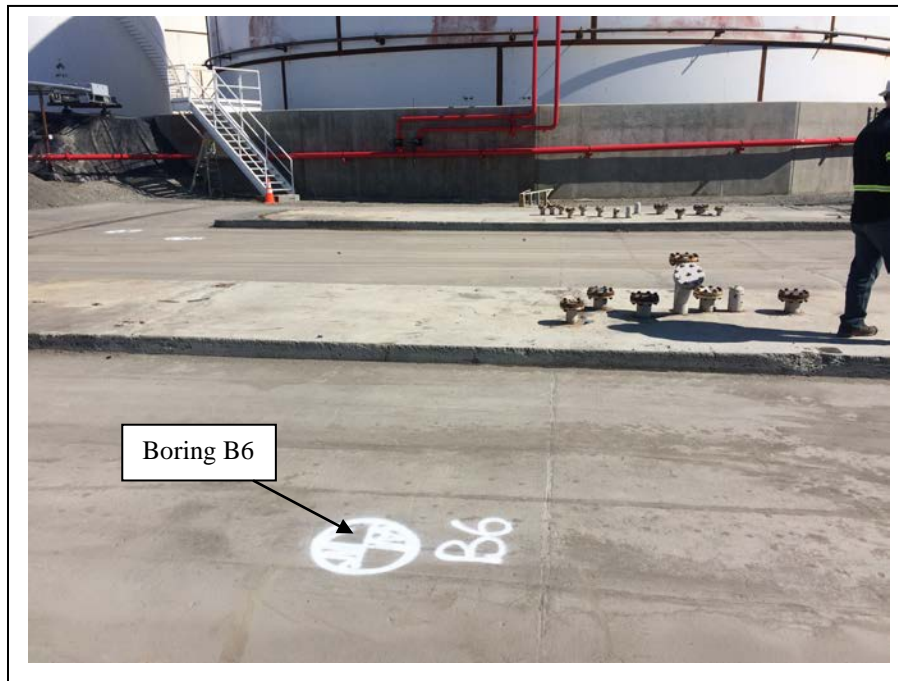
Looking east at soil boring location B6. (May 5, 2017)
